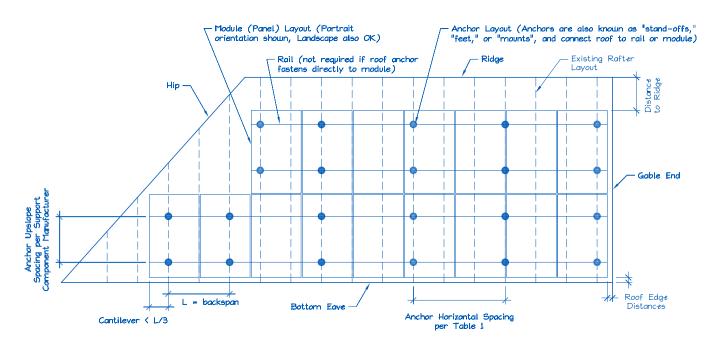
Sample Solar Panel Array and Anchor Layout Diagram (Roof Plan).
